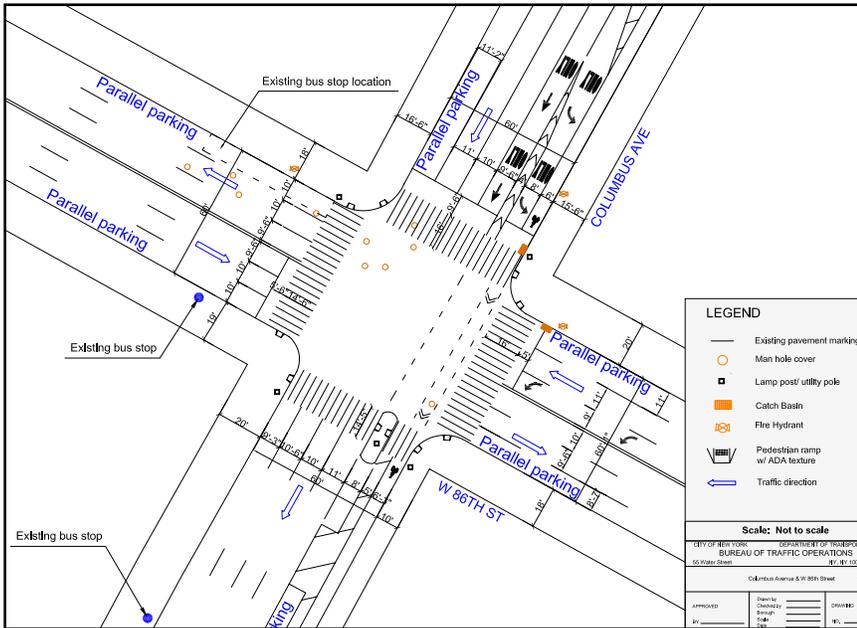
Existing Condition - West 86th Street & Columbus Avenue
